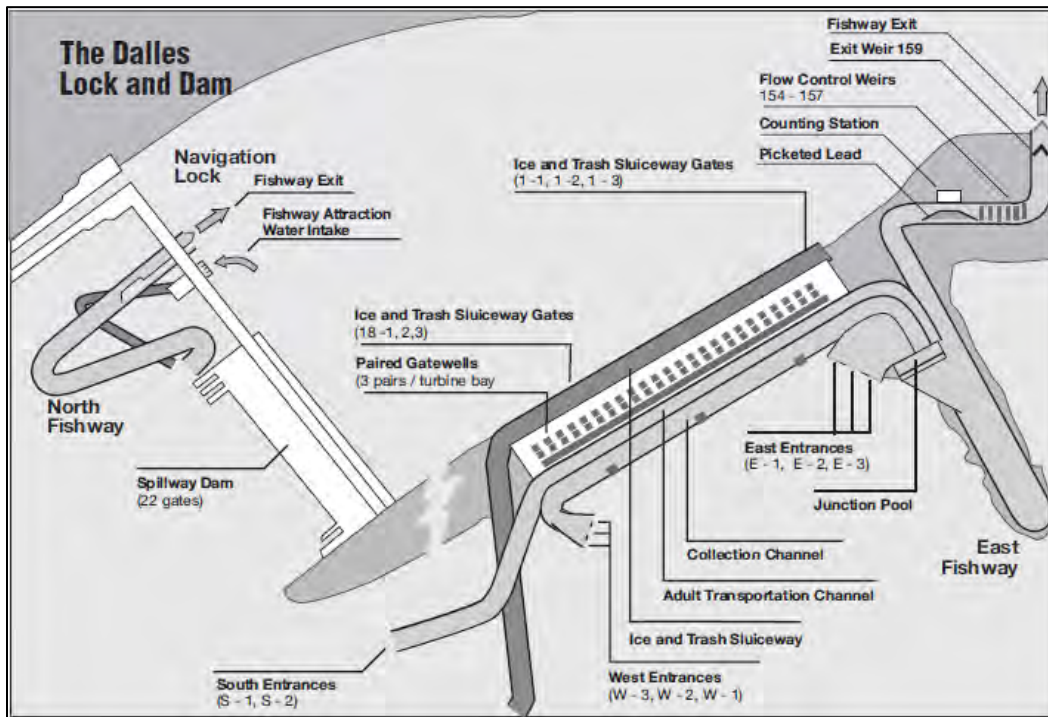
The Dalles Dam Fish Ladder System (USACE 2008)
